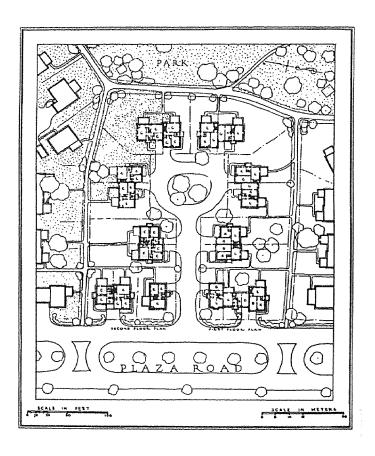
Plan of the Cul-de-sacs in Radburn, New Jersey. (Stein, *Toward New Towns for America*, p.56)
